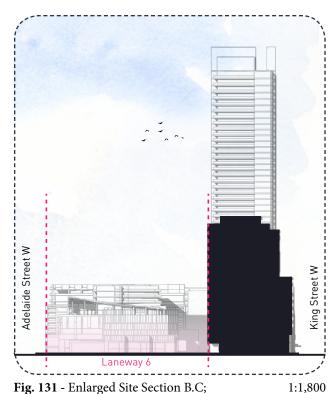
Enlarged Site Section B.C; 2006-2013, section
